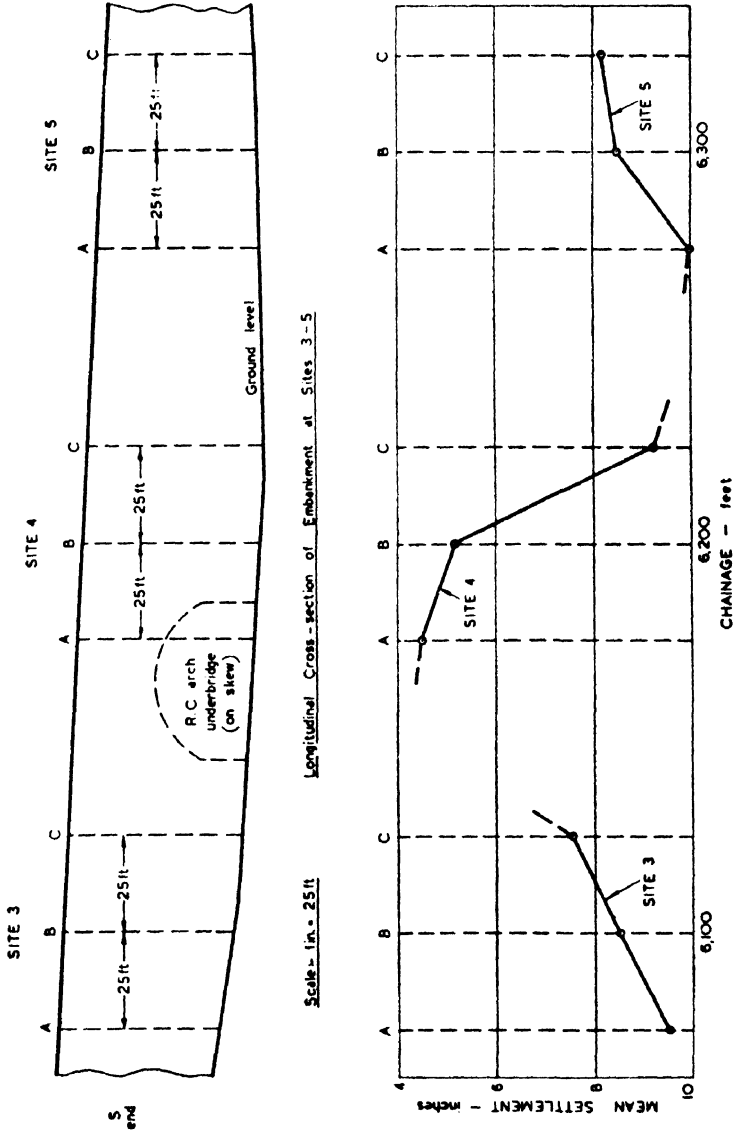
LONGITUDINAL SECTION AND DISTRIBUTION OF SETTLEMENT OF A CHALK EMBANKMENT 45 FT HIGH
